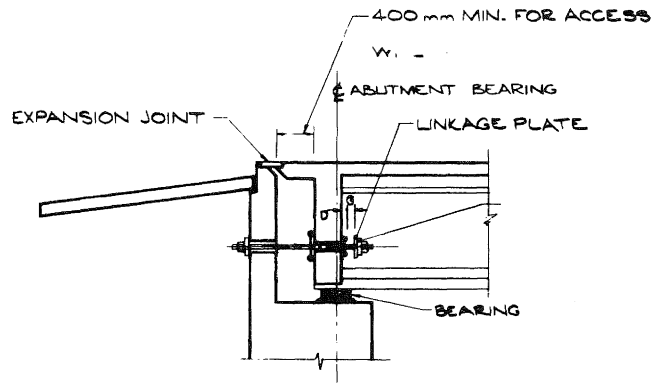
gives some details of standard MWD^{C8.3} seismic linkage hardware, eg. linkage bolts and their associated buffer rings. Alternative reinforced concrete shear key arrangements at abutments and piers are also shown.
